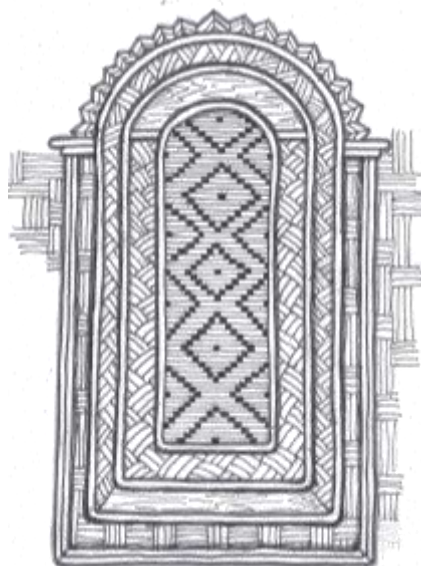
Detailed Framing Adornment around the Bamboo Mat Window in a Contemporary House
